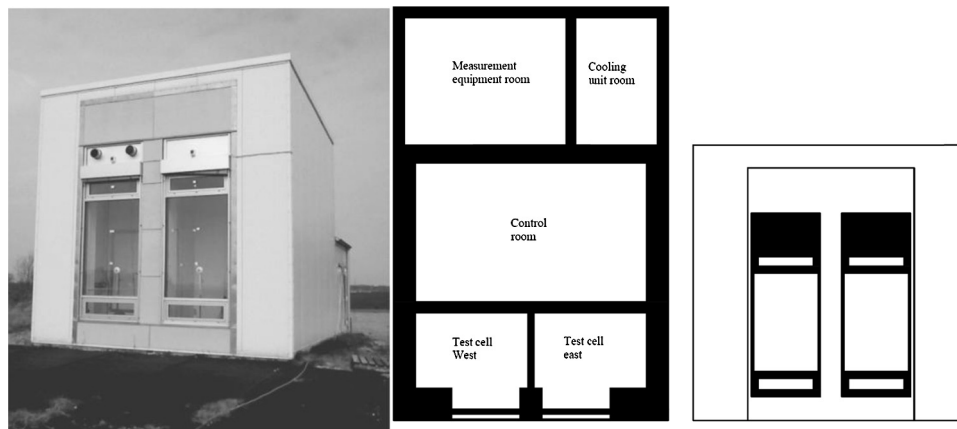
Full-scale façade element test facility (left: test facility, middle: top view, right: front view).
